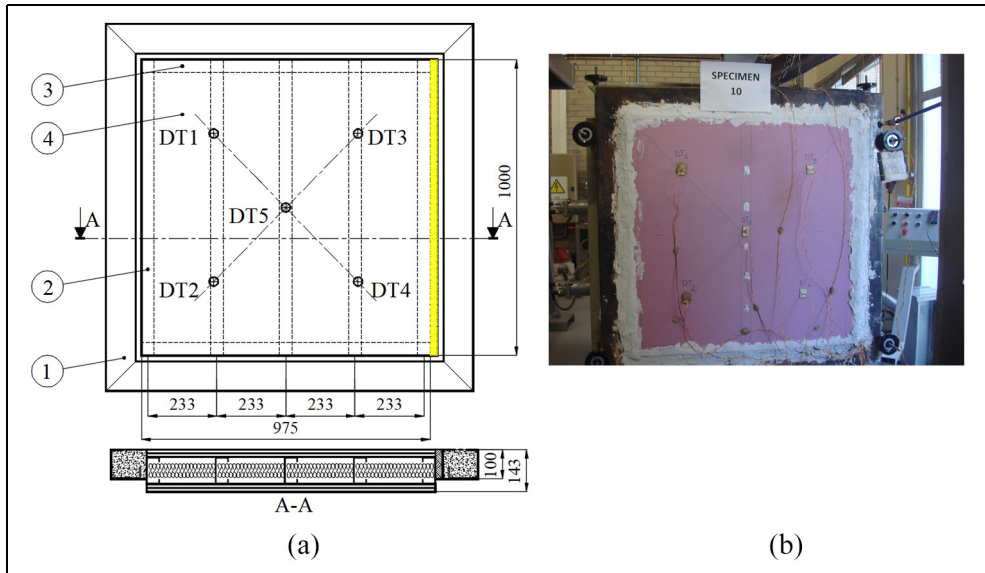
LSF wall specimen and testing frame (1). Vertical studs (2), horizontal tracks (3) and layer plates (4) and position of the disc thermocouples (DT_i) in the unexposed surface (dimensions in mm).
